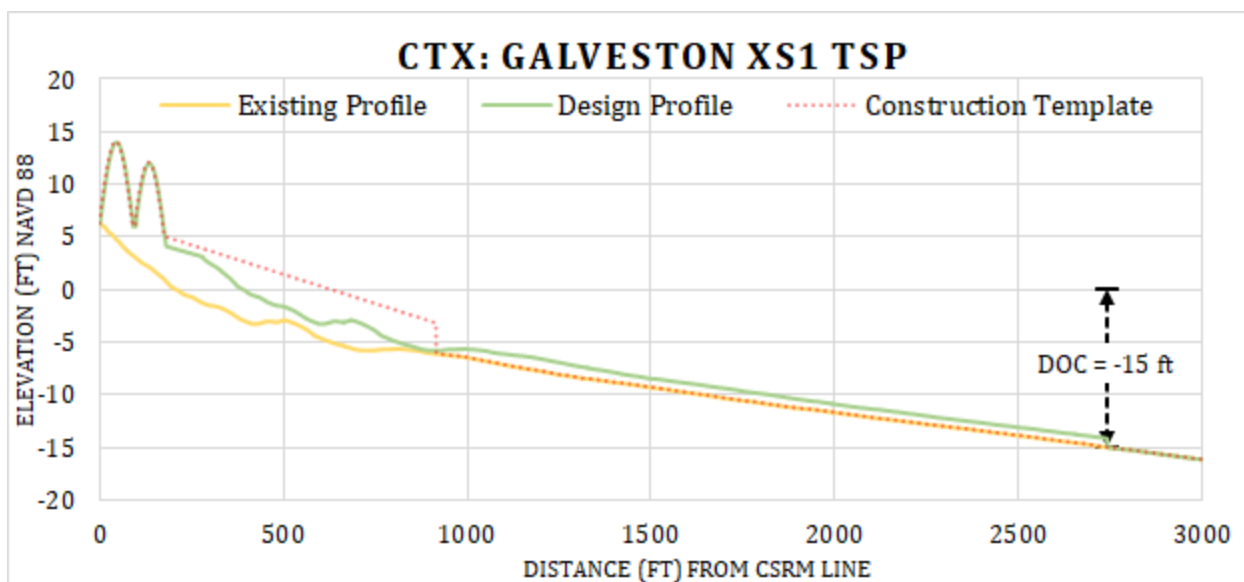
Galveston XS1 TSP; Construction template volume = 7.5 cyd/ft, top elev. at +5', slope at 1:90
